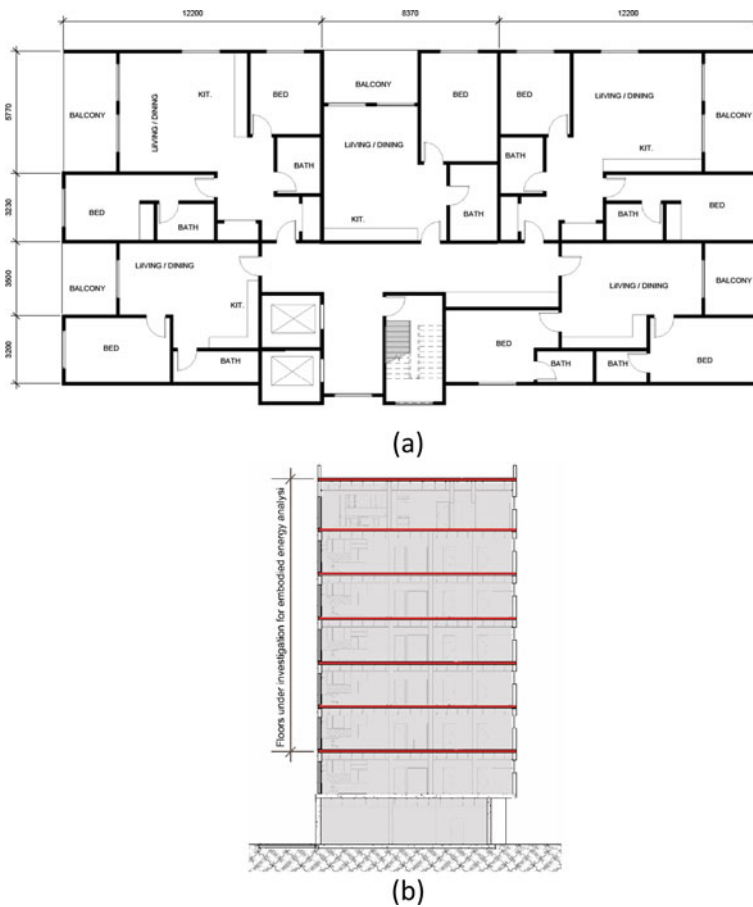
a Floor plan of the apartment building b Cross section of the apartment building showing the floors (in red) under investigation for embodied energy analysis
